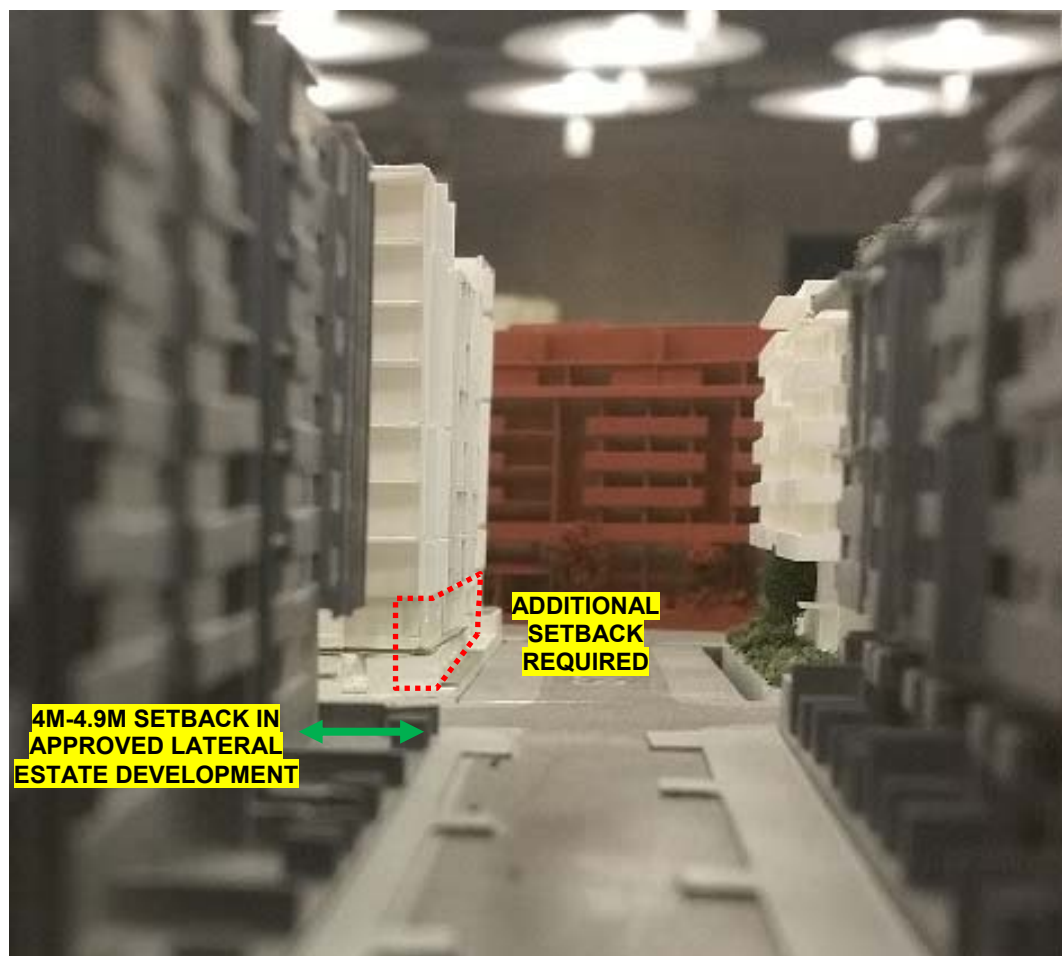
Indicative view down Sonny Leonard Street showing building alignments.
